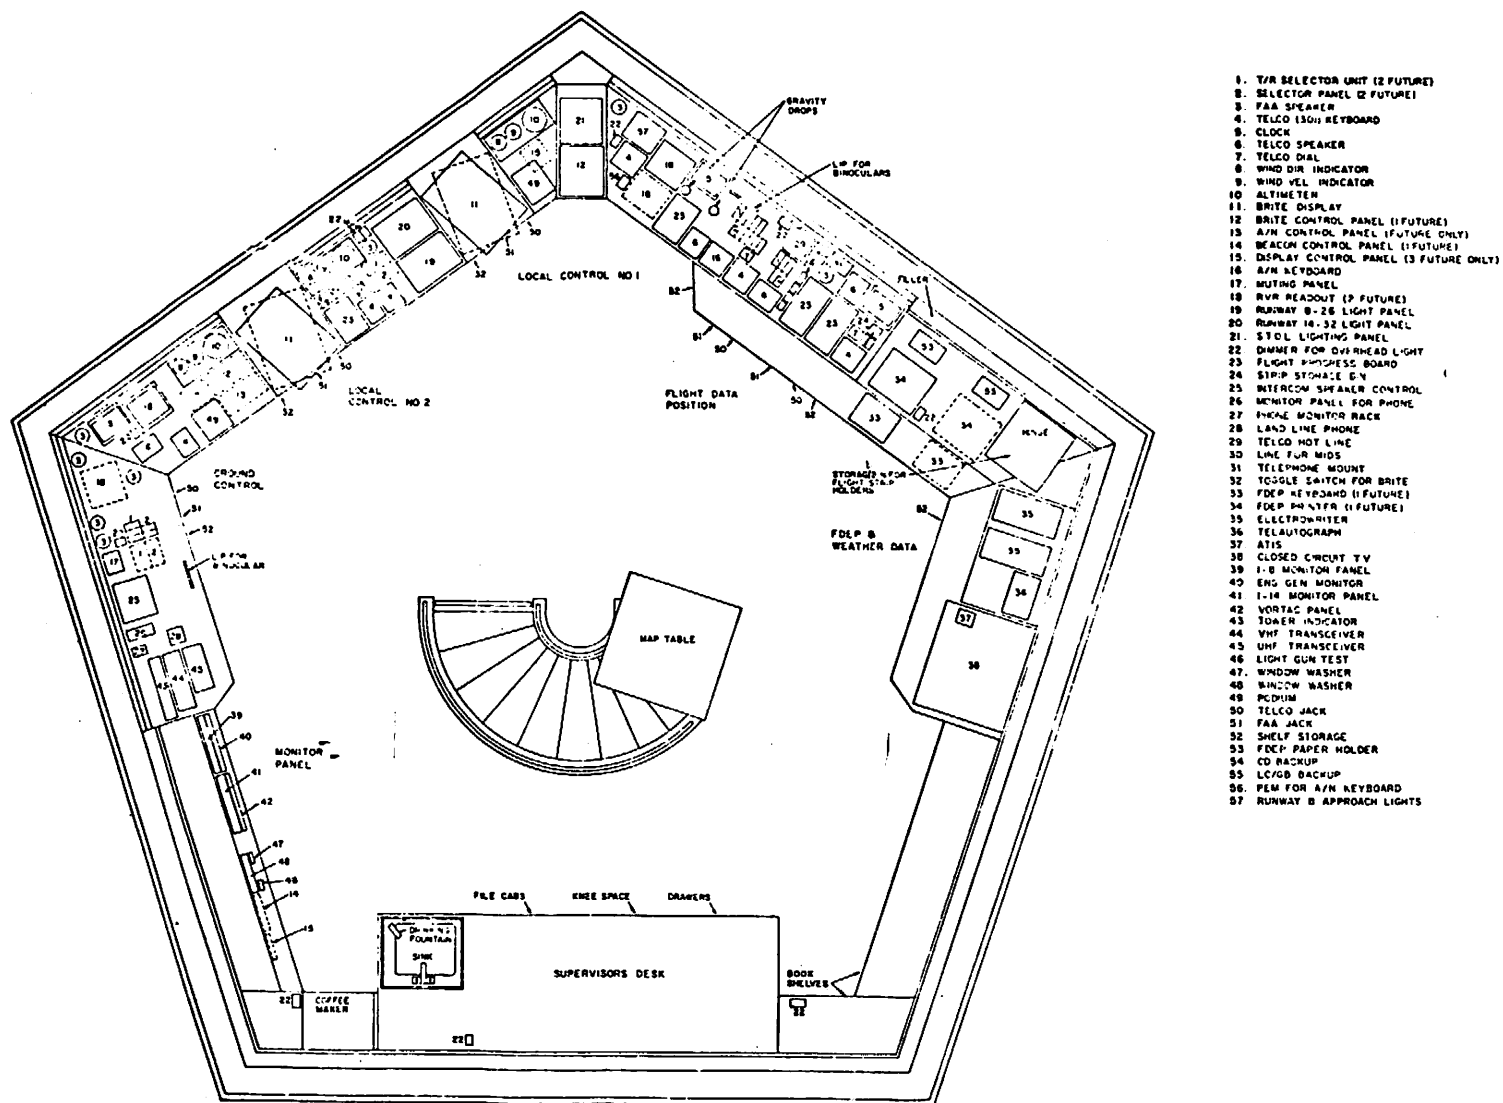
LAYOUT OF HOUSTON TOWER
